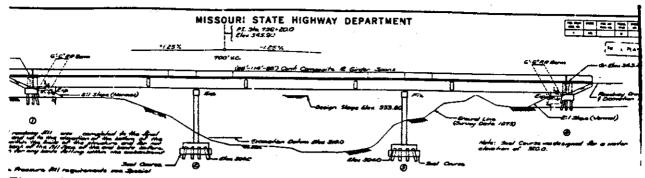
Bridge General Elevation (Old St. Francis River Bridge)
